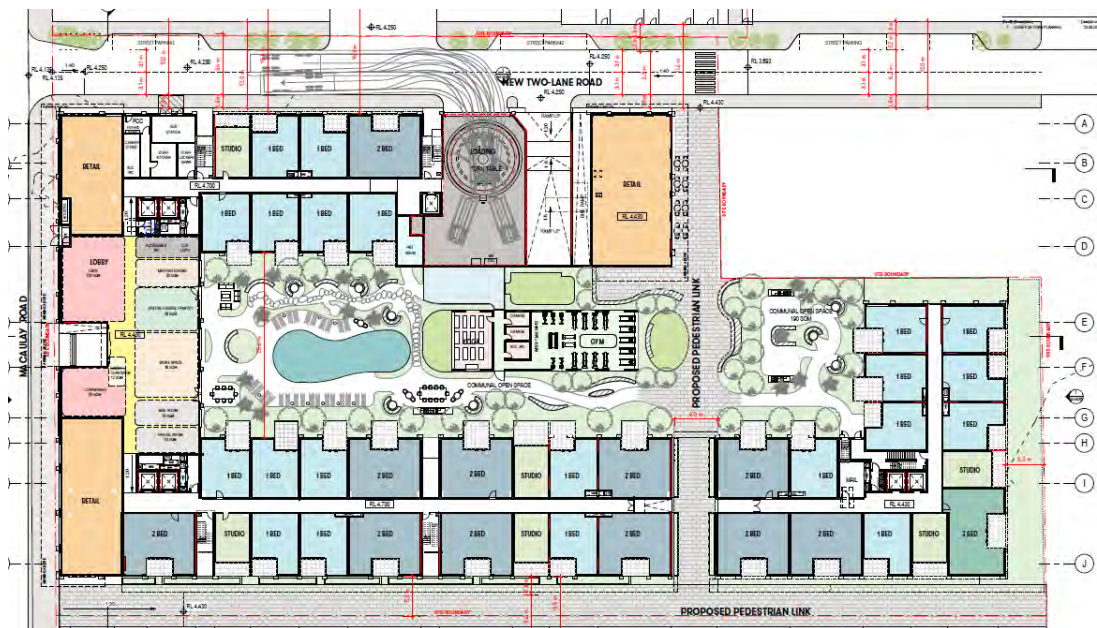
Ground Level Plan extract of Ministerial Planning Application PA2201709. From Drawing AD-DA100
